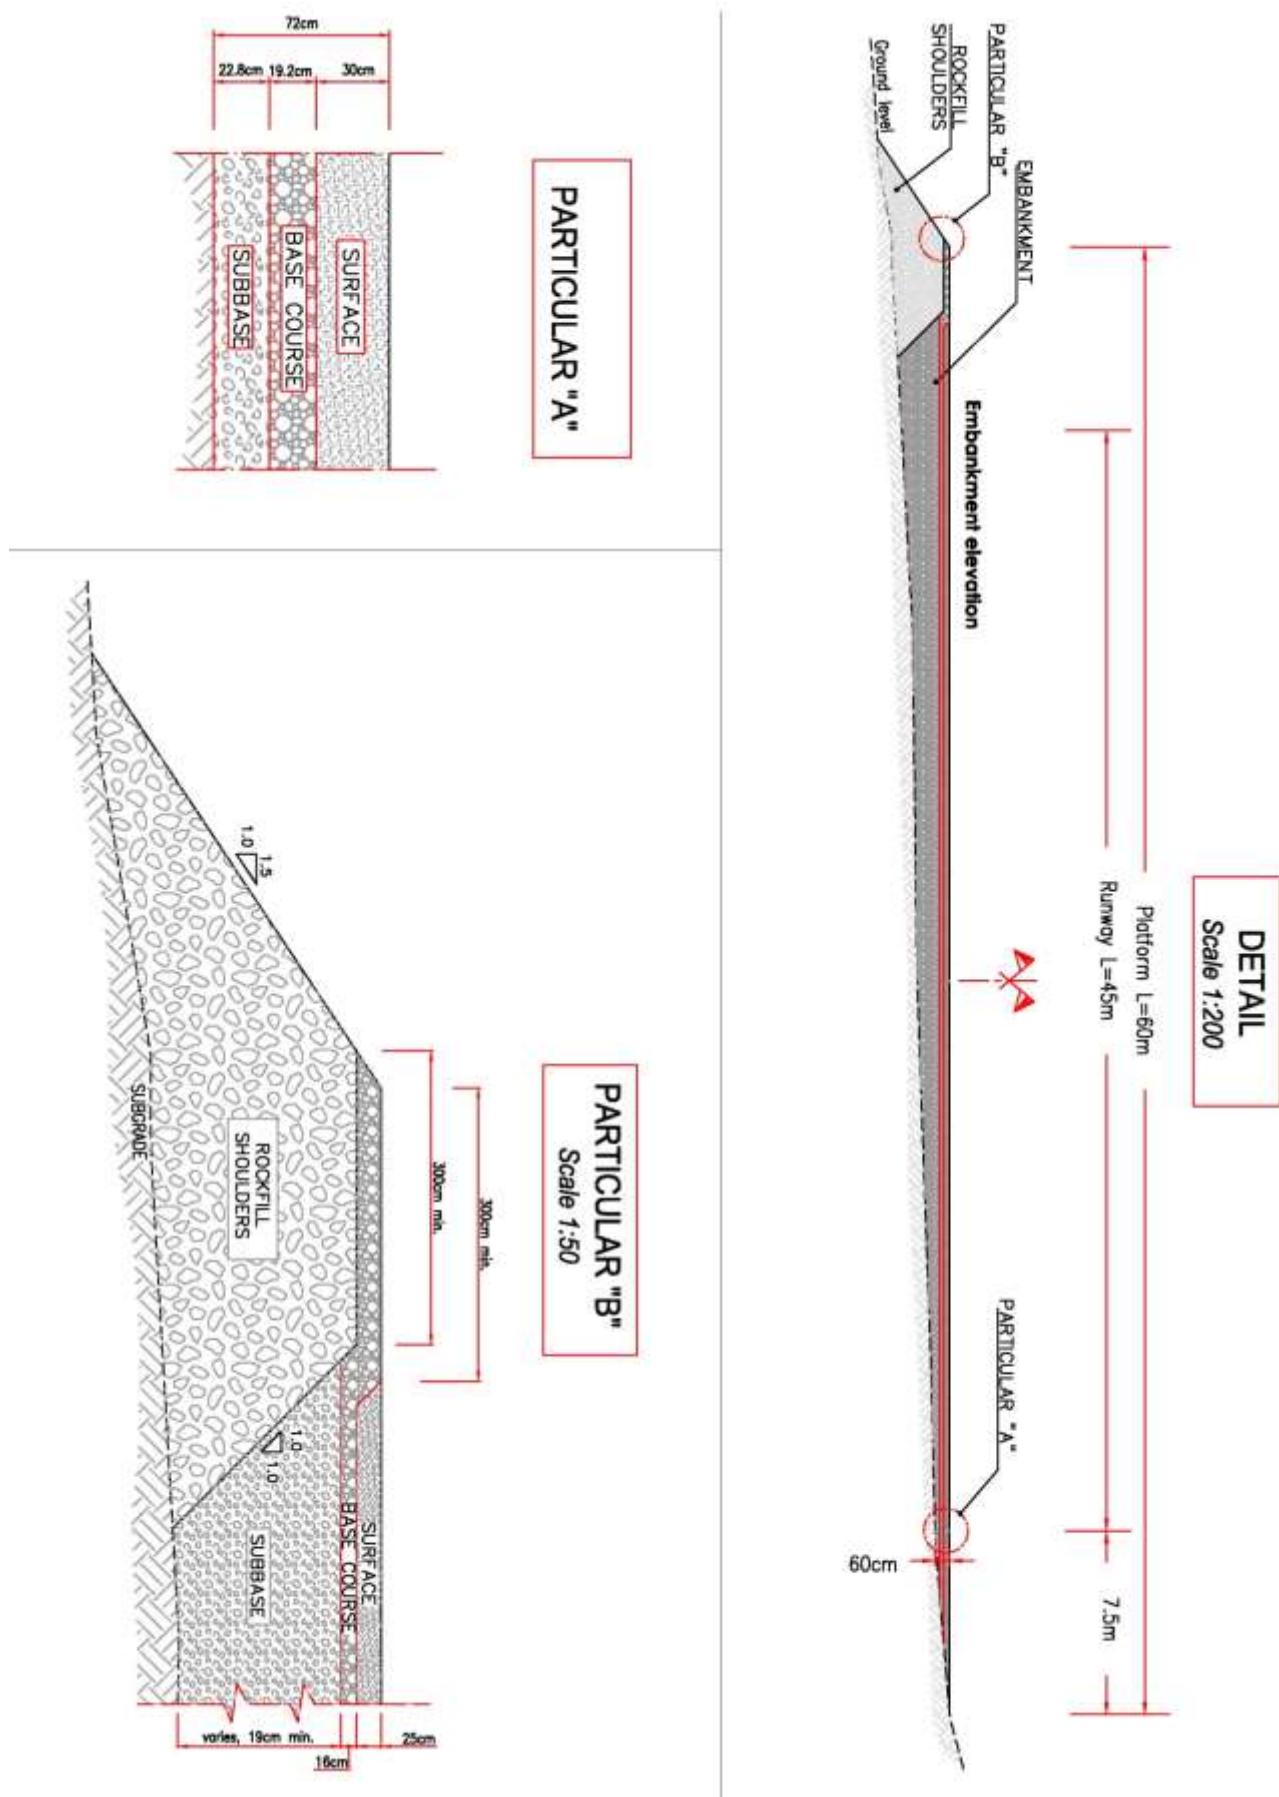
Detail of Runway section, with embankment and shoulders profile.
